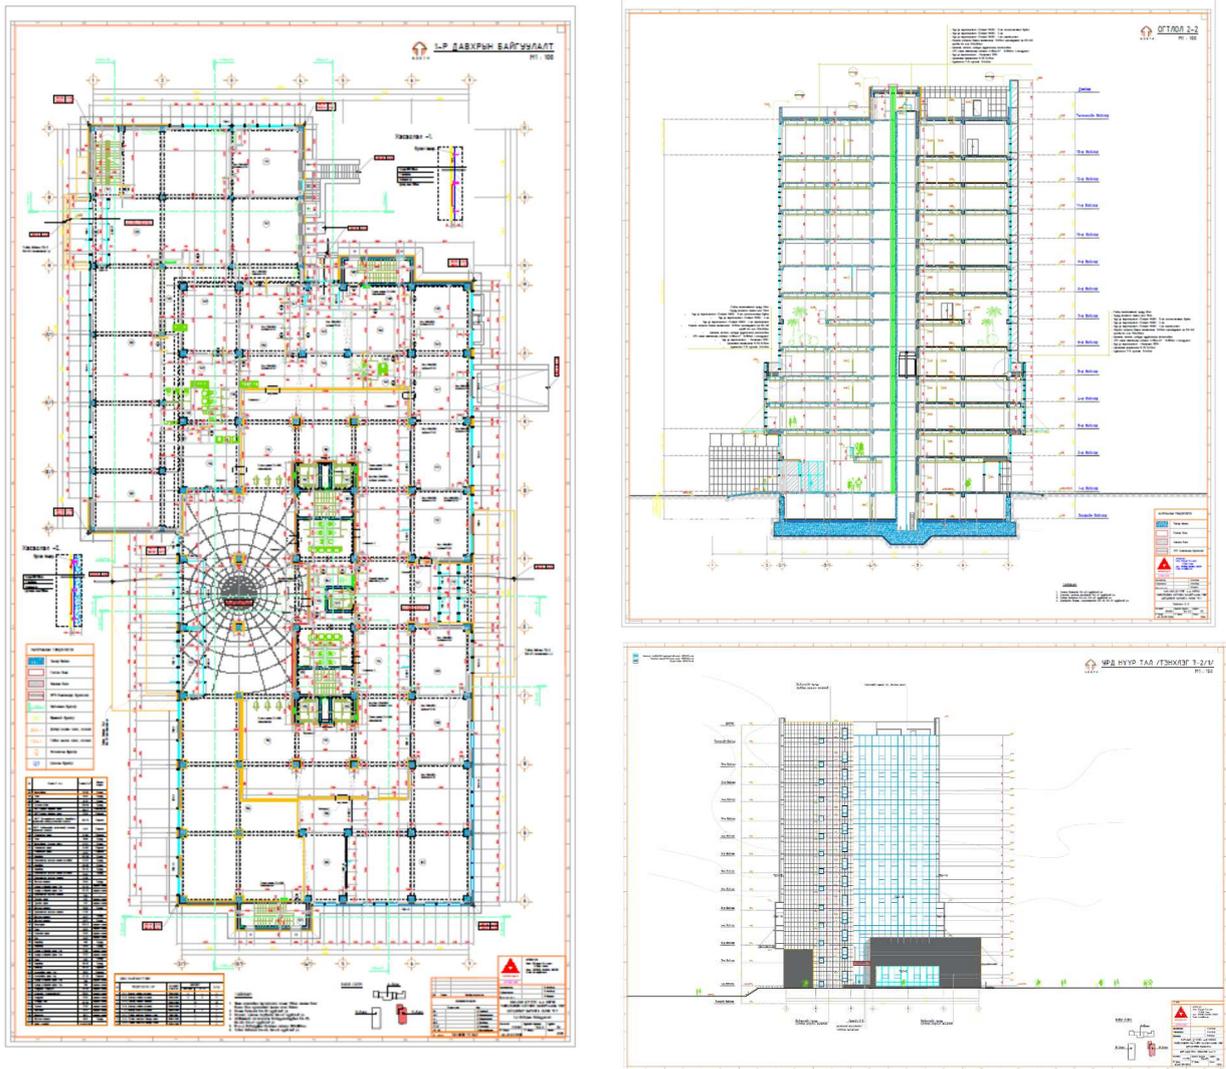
Floor Plan and Cross-Section Drawing (B Block of New Ulaanbaatar City Hall)
